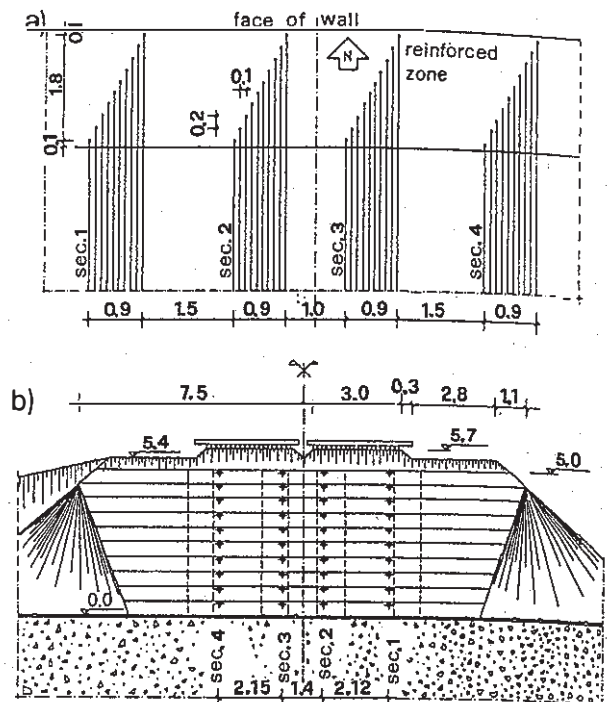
Layout of instrumentation: a) plan view of cables installed on odd numbered reinforcement layers; b) front view of test wall with reference plates to measure displacements at the face.
